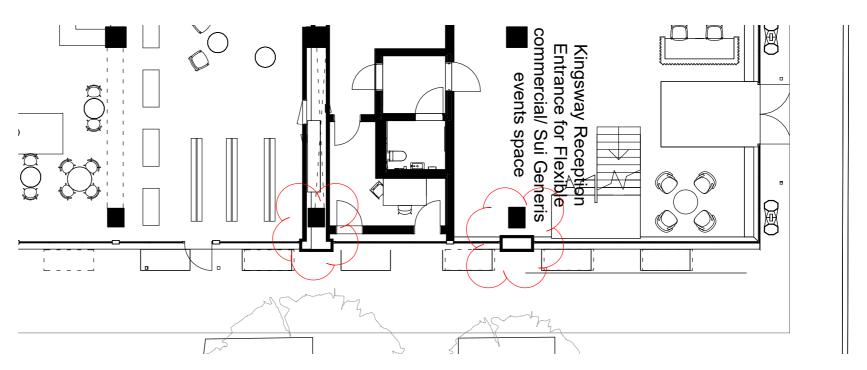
Proposed Amendments - Consented Ground Floor Plan
